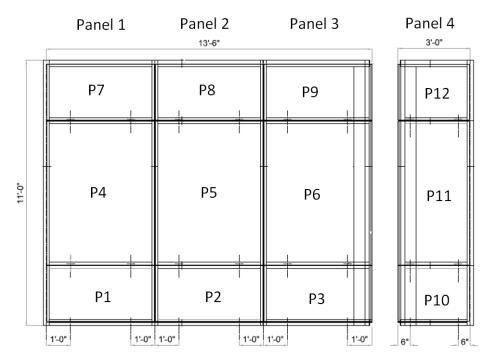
Elevation view of three panels and a perpendicular panel of a 4SSG curtain wall system (recreated from drawing provided by Bagatelos Architectural Glass Systems Inc.)
